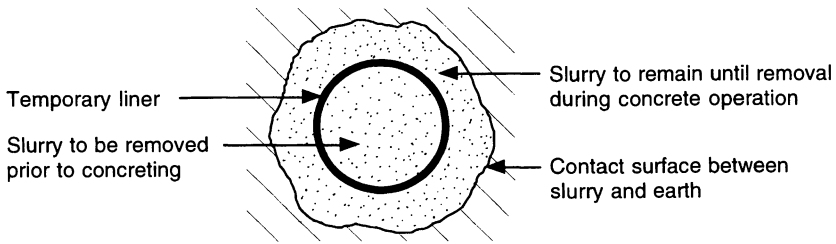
Temporary liners in place in a pier hole filled with slurry.
